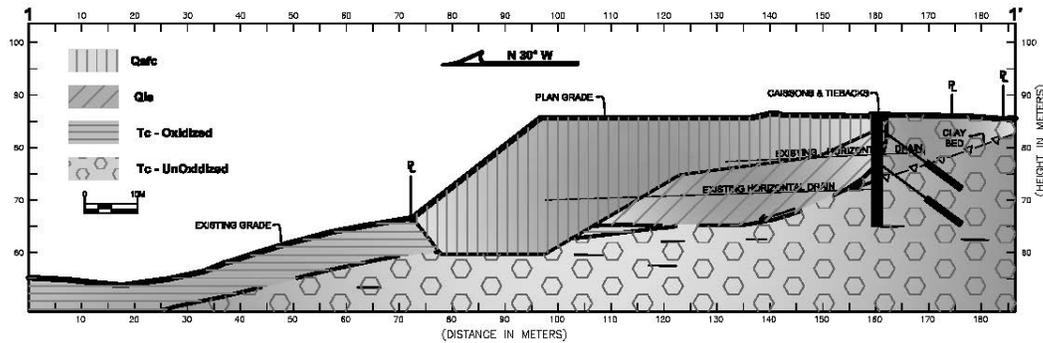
Cross Section of Keyway/Toe-Surcharge Repair Option
